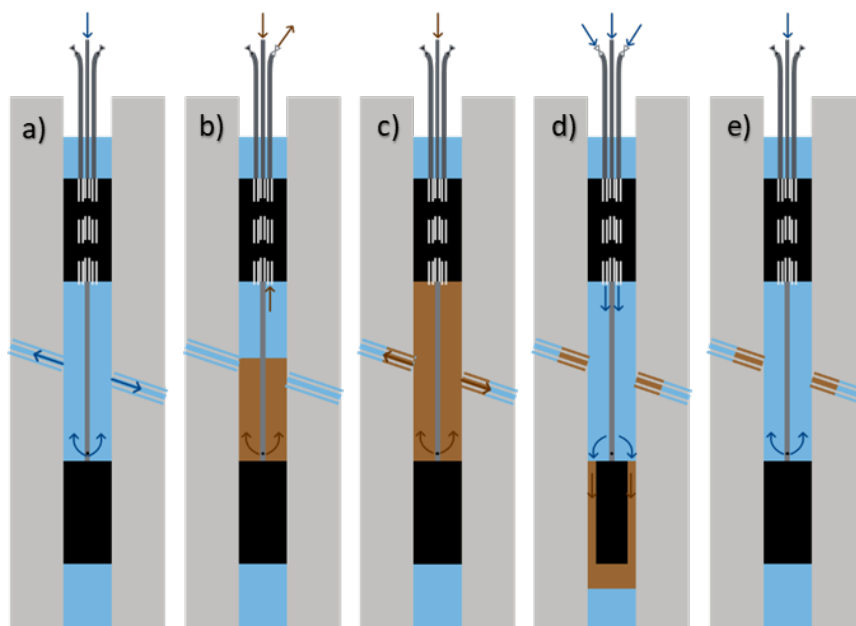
Schematic of the grouting and hydraulic testing procedure. Flow directions are indicated by arrows. a) Pre-grouting hydraulic test. b) Grout filling and water evacuation. Collection of grout samples via return tubings. c) Grouting. d) Grout evacuation. e) Post-grouting hydraulic test.
